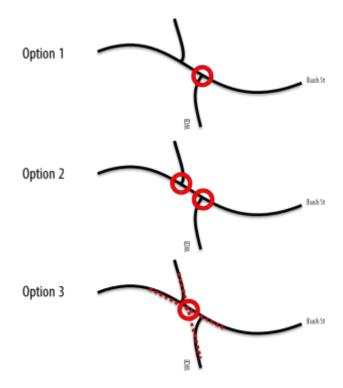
Roundabout Alternatives for Winston Churchill Boulevard at Bush Street
